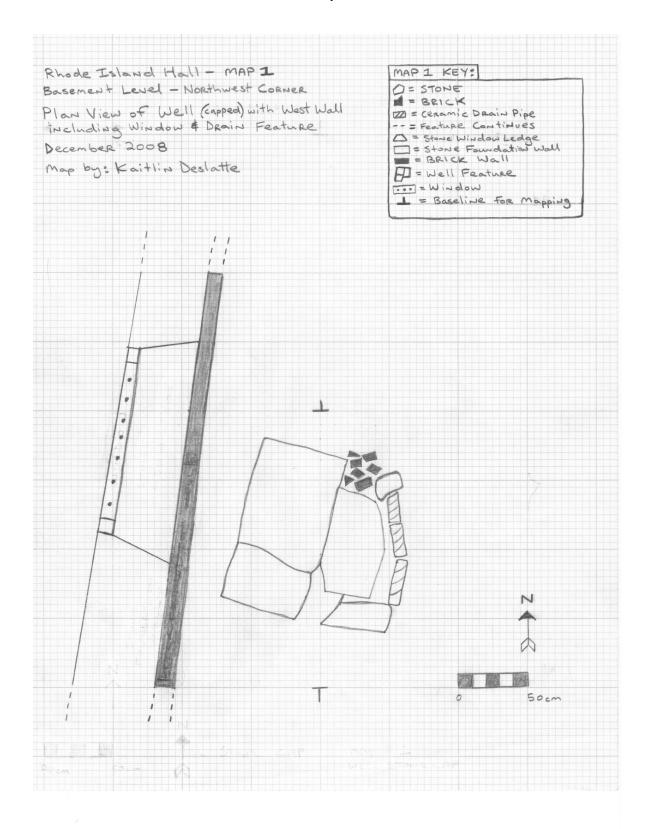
Survey Map 1 illustrates the plan view of the capped stone well along with the terracotta drainage pipe system and their association to the west wall of the building.
